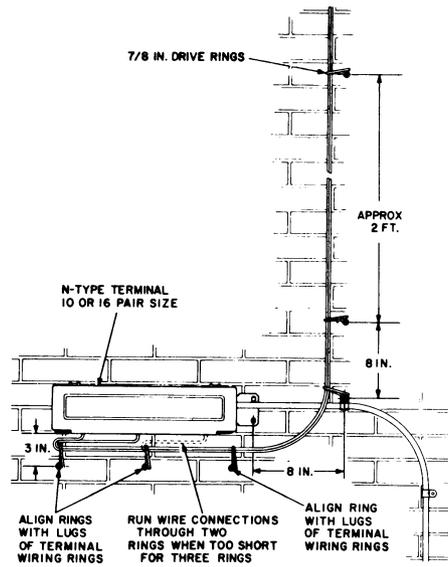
Horizontal-Mounted Cable Terminal With Stub Turned Down
